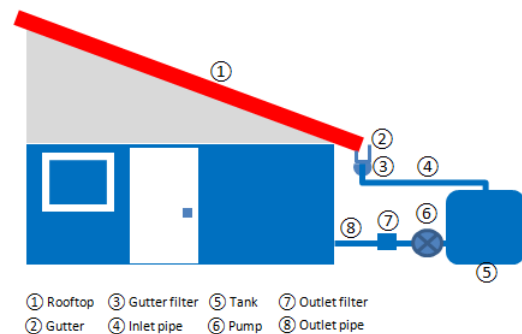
Rooftop Rainwater Harvesting (RRWH) system
